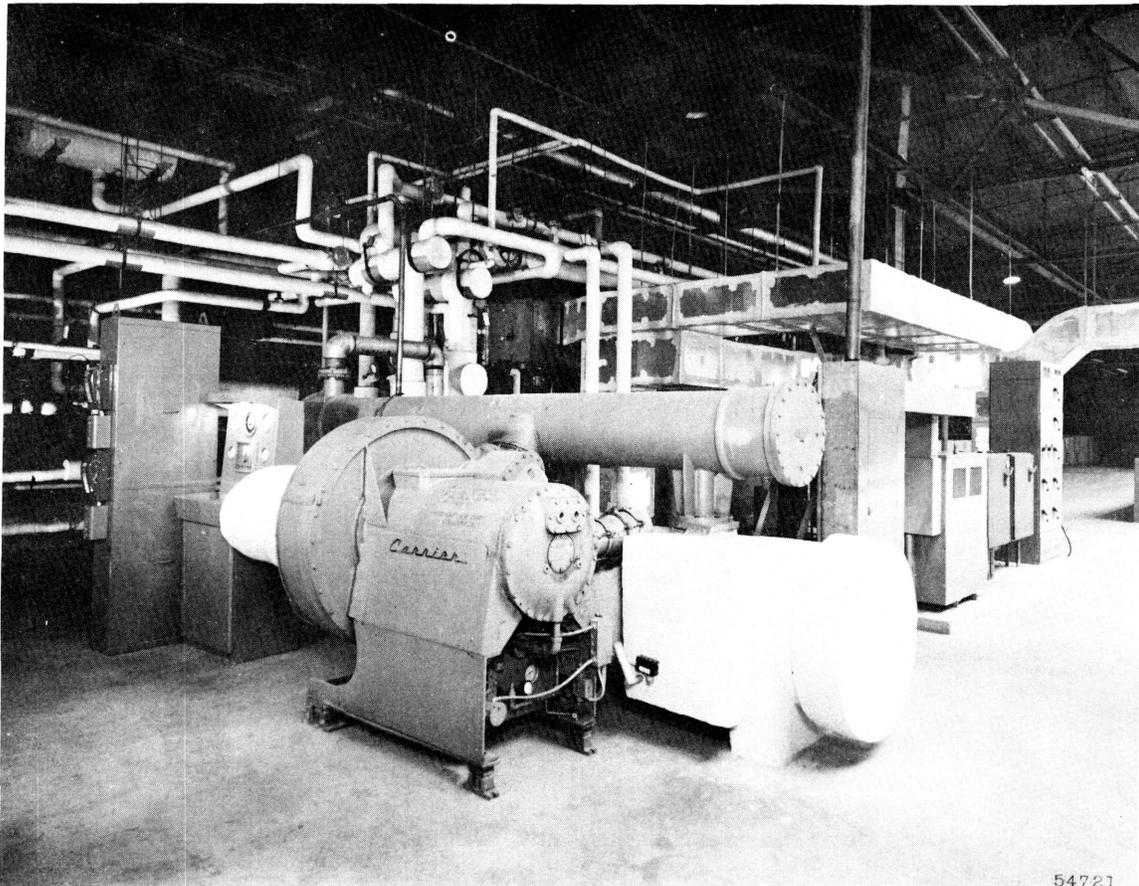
Refrigerating machine for supplying chilled water to cooling coils
